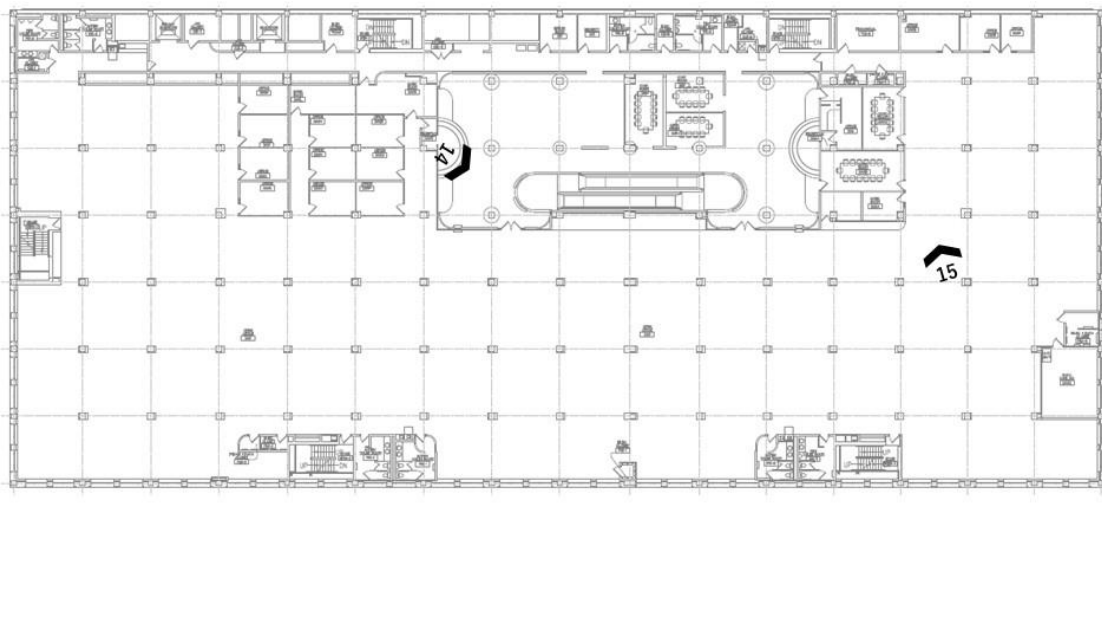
Photo Map, Second Floor, Photos 14, 15.
